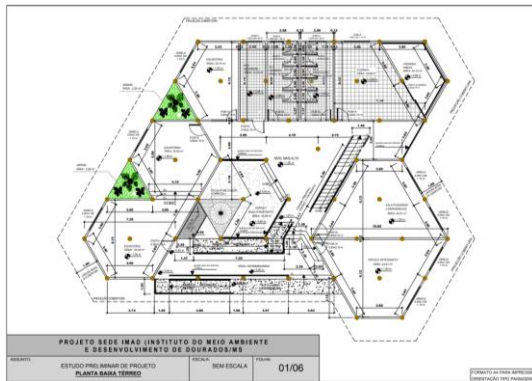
IMAD’s Collective Centre for Development proposed building, ground floor plan.
